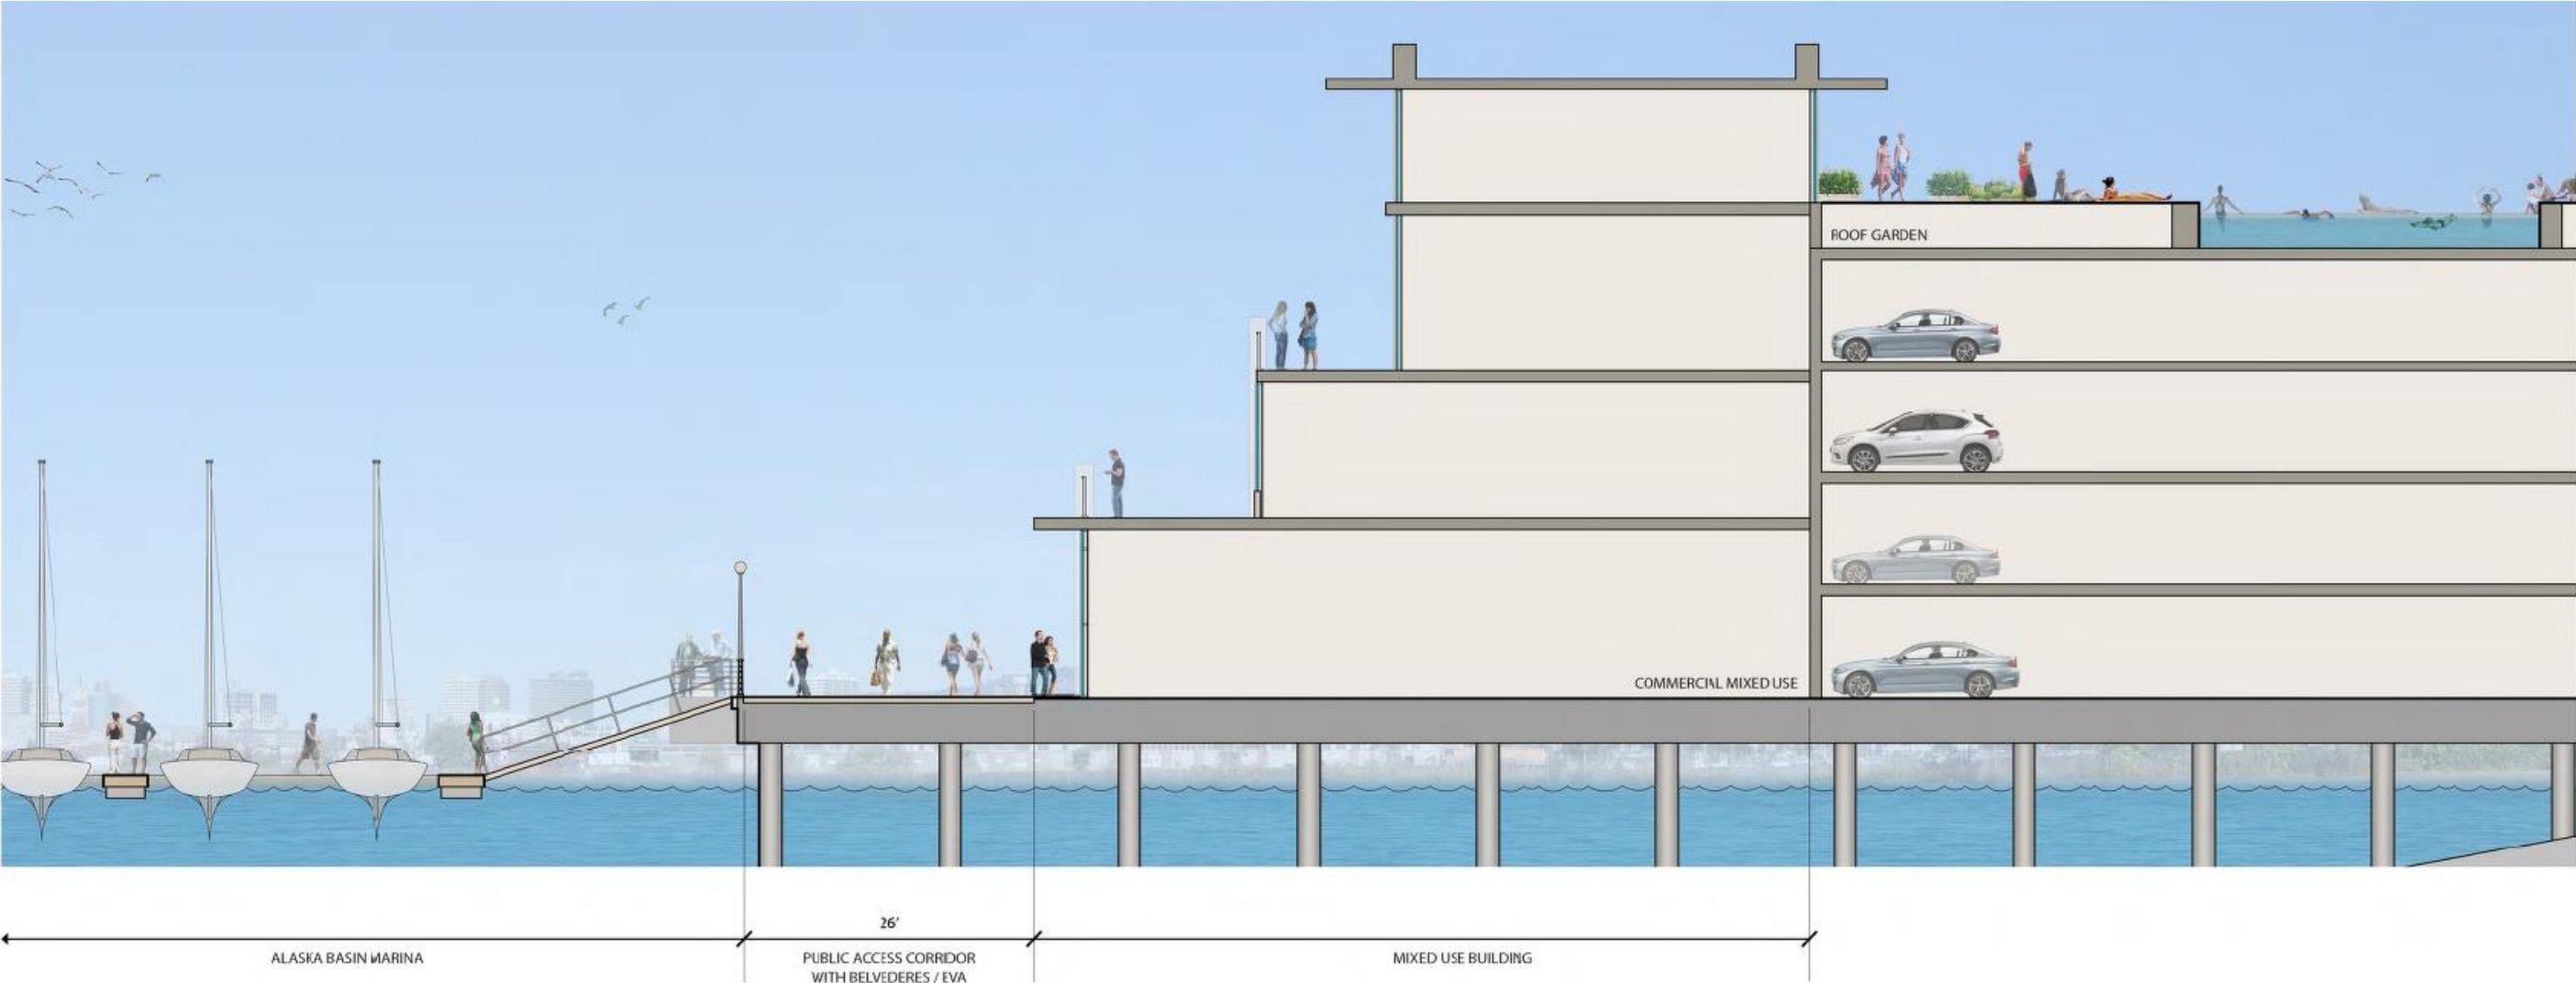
ILLUSTRATIVE CONCEPTUAL CROSS SECTION D: PUBLIC WATERFRONT PROMENADE ADJACENT TO MIXED USE CENTER AT NORTHWEST CORNER OF THE SITE (VIEW NORTH).
